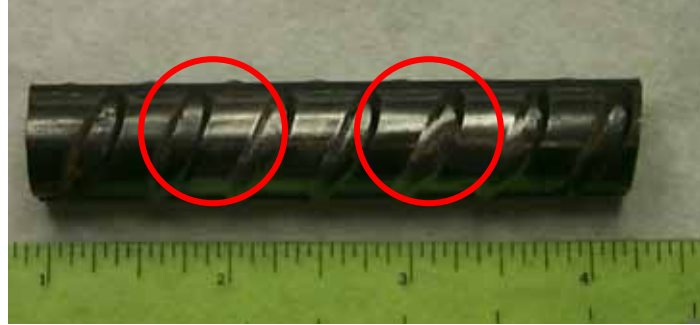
Photo. Abraded MMFX-II™ specimen.
